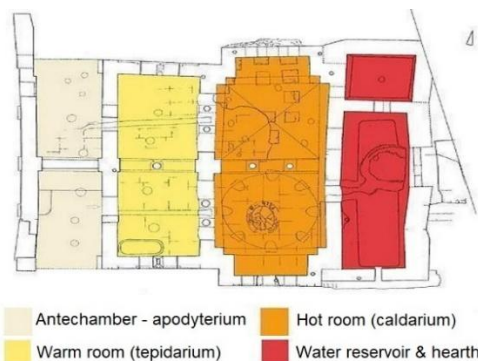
Plan of Byzantine Bath (Drawing by architects Fani Revithiadou and Konstantinos T. Raptis [1]).
